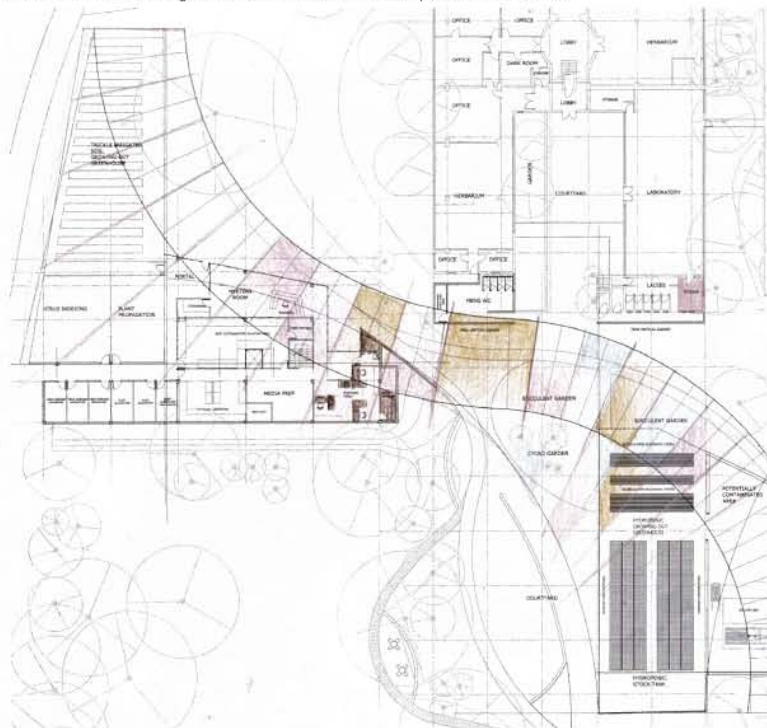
Deriving a structural logic. Trapezium shapes for main supporting structure proved to be successful at creating the desired shape on plan between the two glasshouse facilities. September 2008
